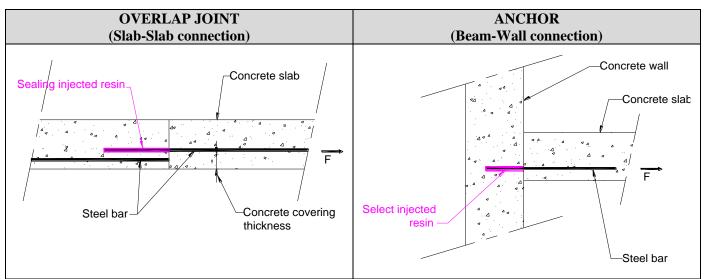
Sketches of a Slab-Slab connection left and of a Beam-Wall connection
